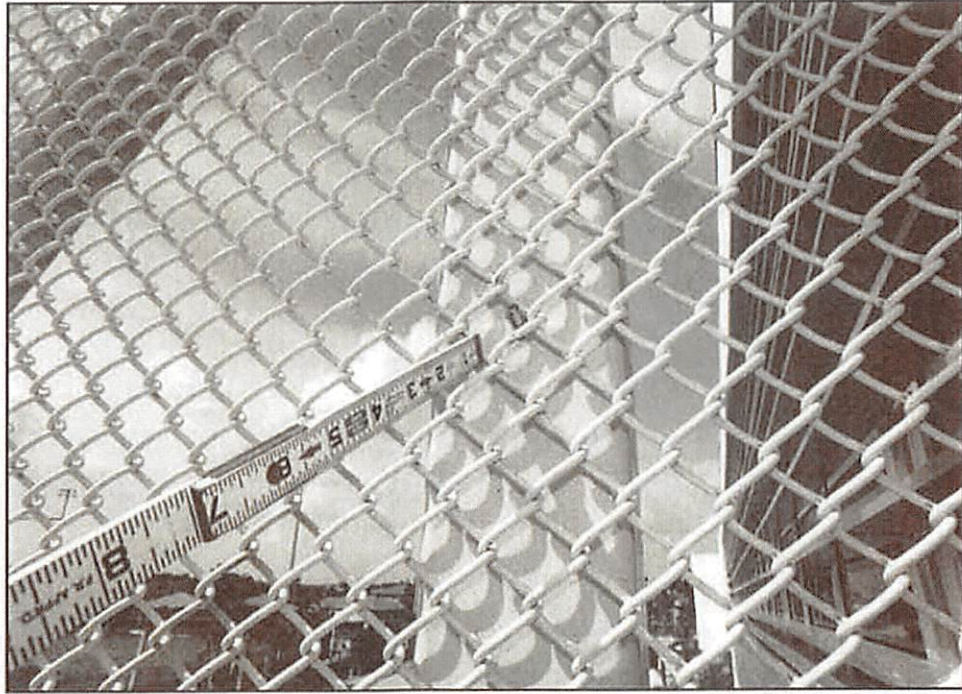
Typical missing connection fastener to vertical truss member on the chain-link fence. (Shown Vertical member # 2)
